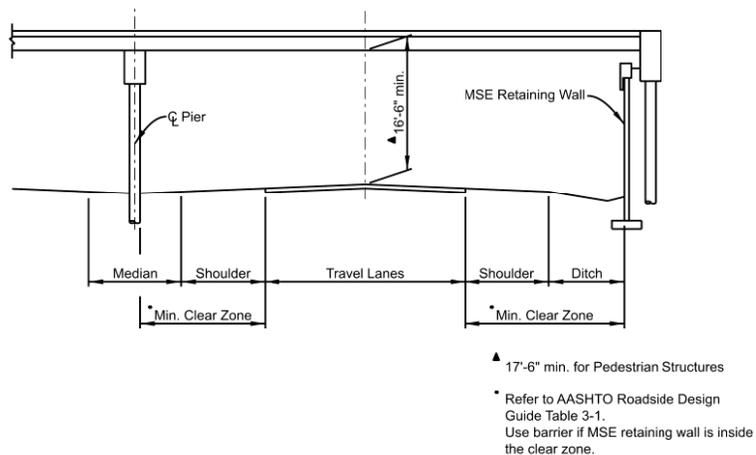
Bridge Clearances with MSE Retaining Wall
